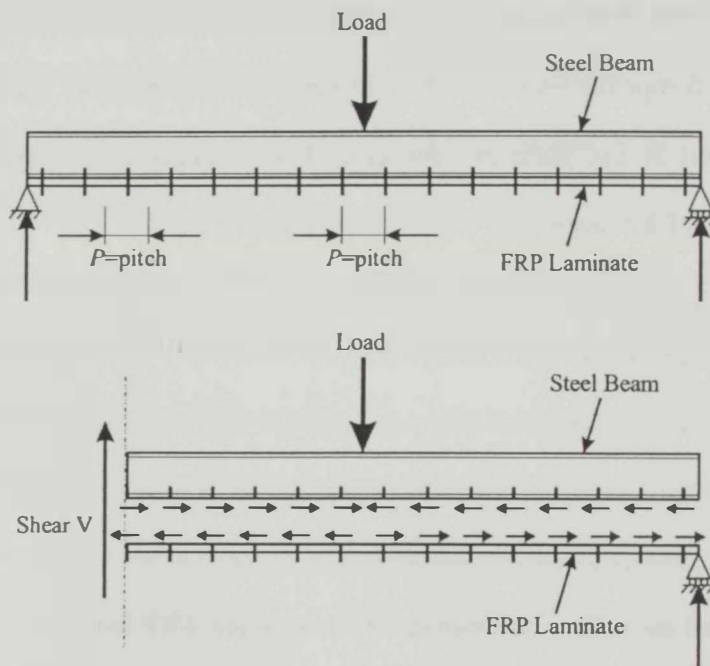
Shear Forces in Fasteners of a Typical Steel-FRP Composite Beam
